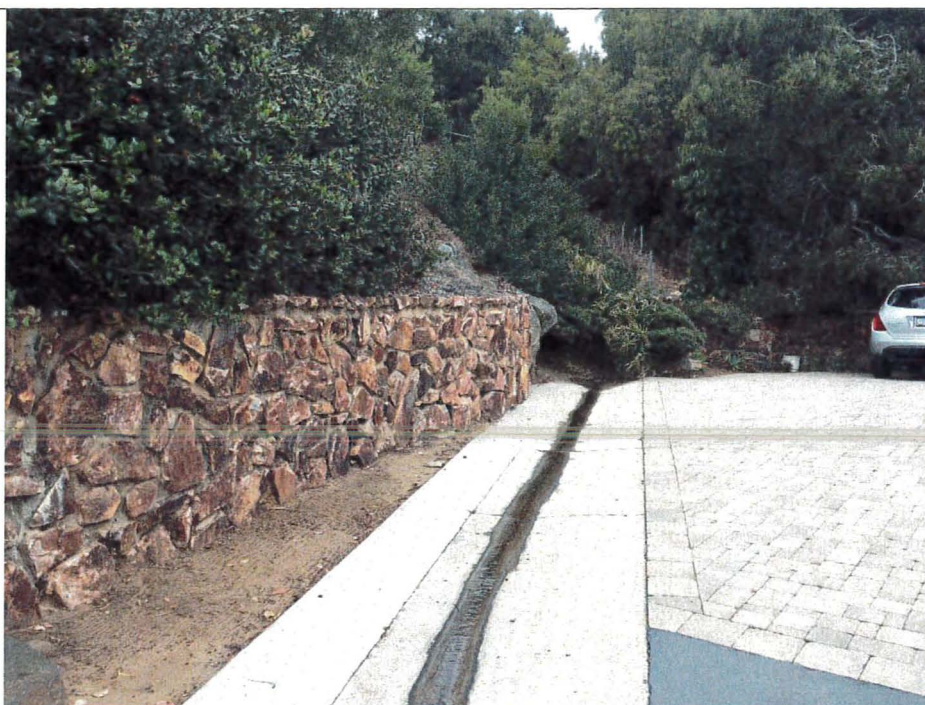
Culvert outlet and shallow concrete swale on adjacent property, facing north.
